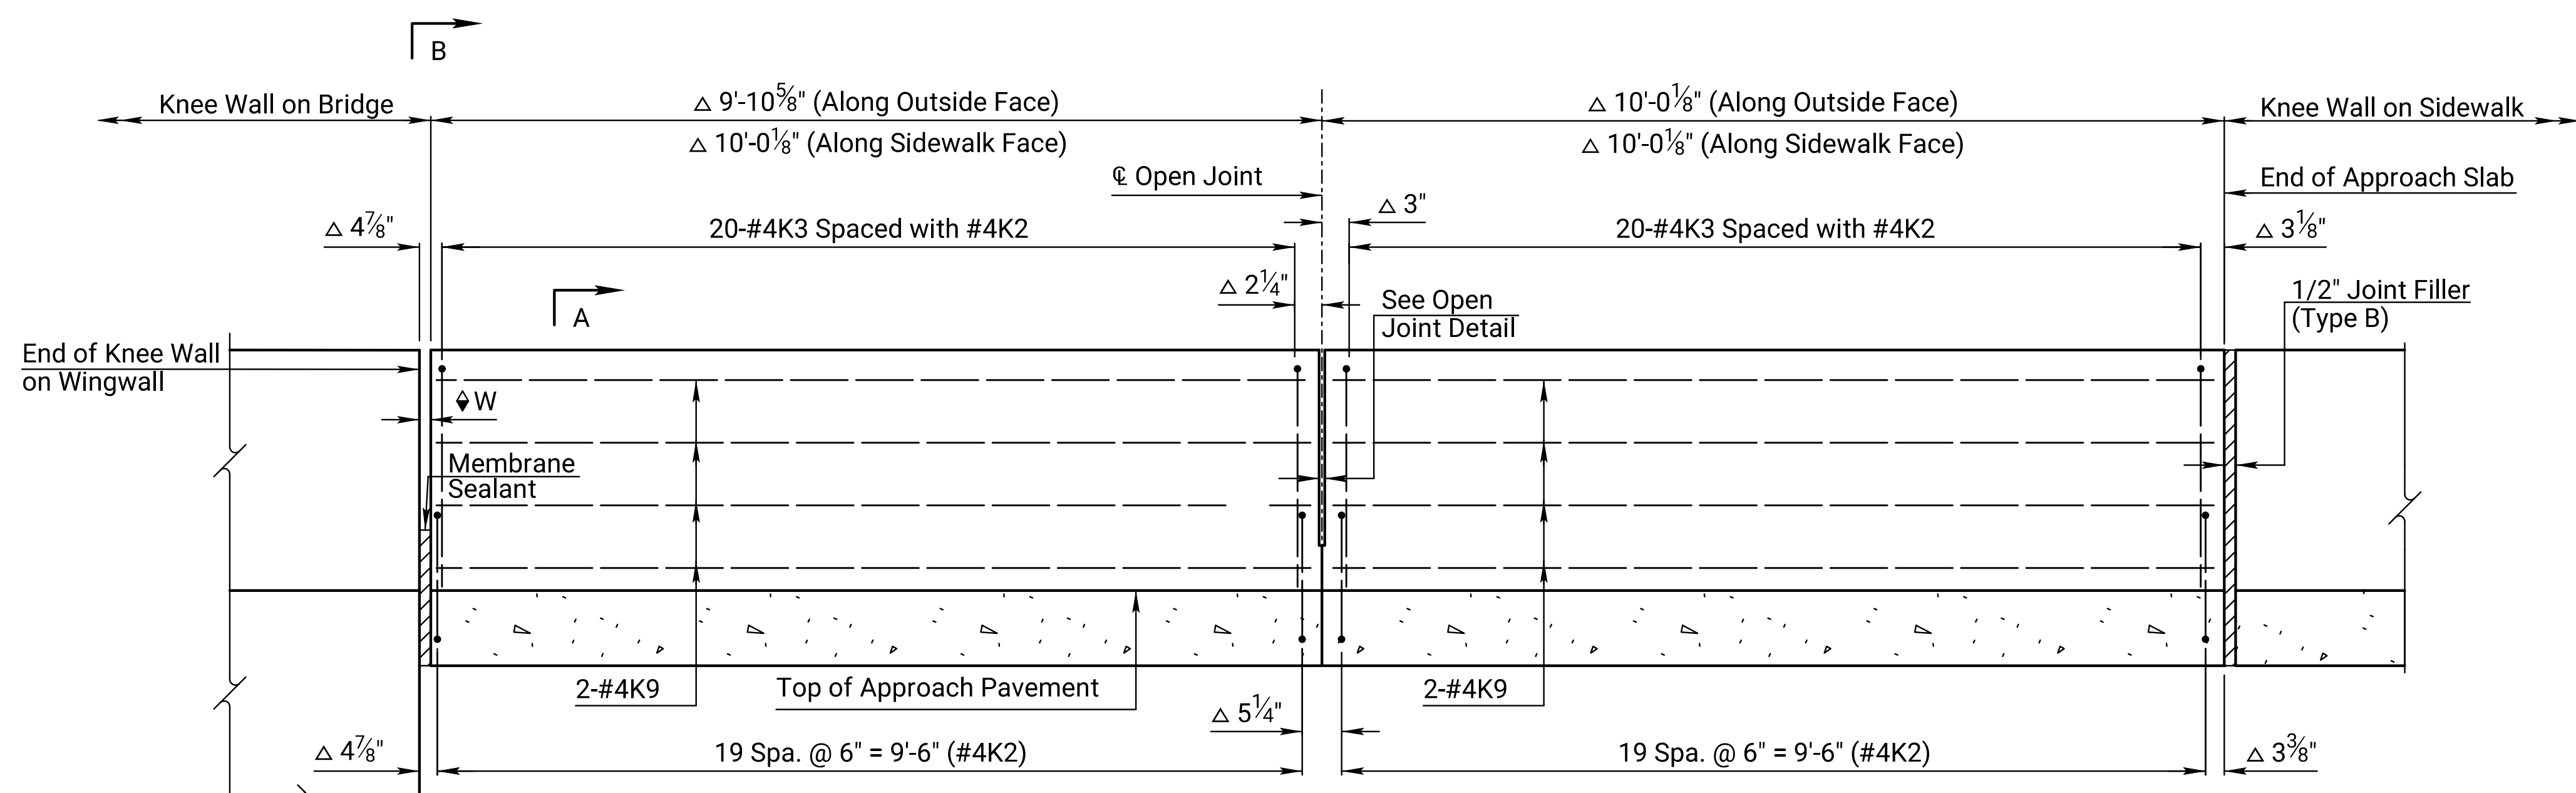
DETAILS OF NORTHEAST CORRAL RAIL ON APPROACH SLAB
